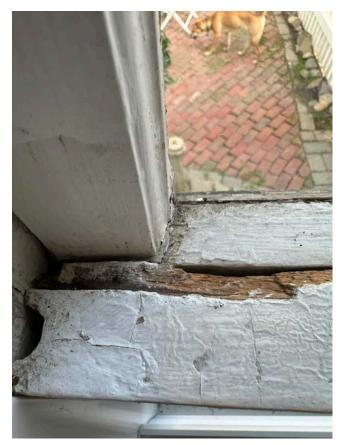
ROTTEN WOOD ON WINDOW, FROM INTERIOR REAR ELEVATION
